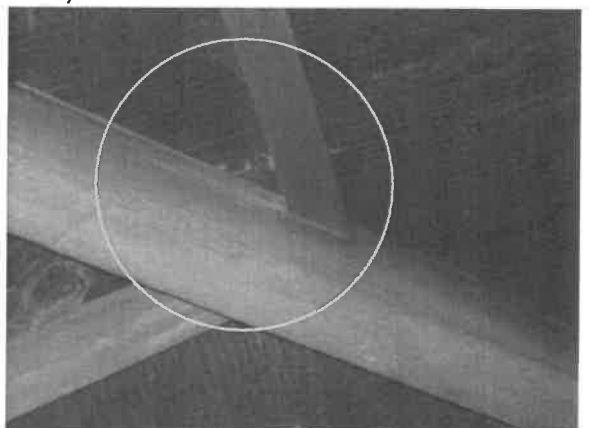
Likely bat roost position at cobweb free roof timber with staining caused by the oils on bat fur
